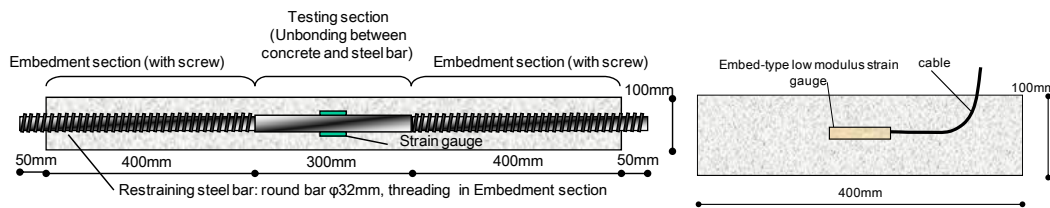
Specimen for the shrinkage cracking experiment, left: restrained cracking test specimen, right: free shrinkage test specimen
